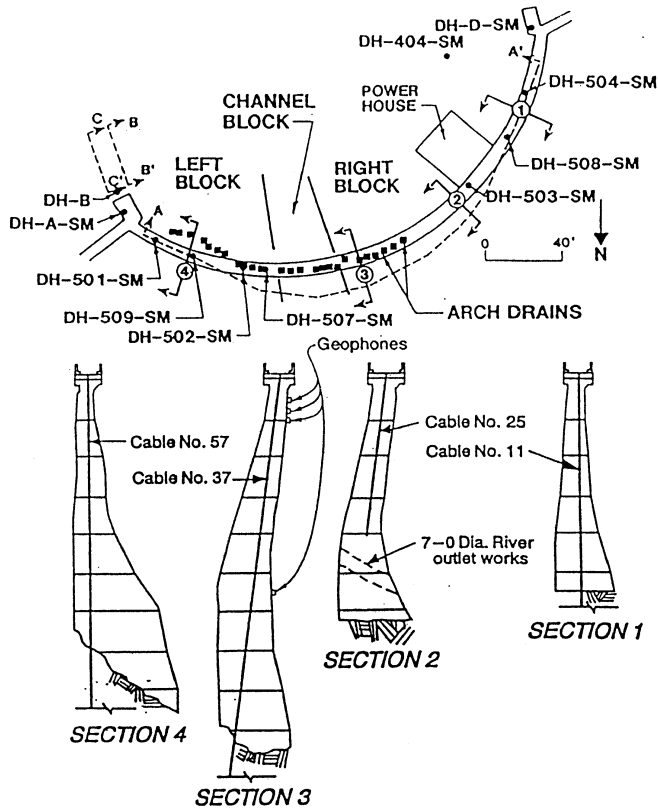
Typical sections through the arch, showing inclination of anchorages, positions of toe drains, and locations of geophones. Stewart Mountain Dam, AZ.
